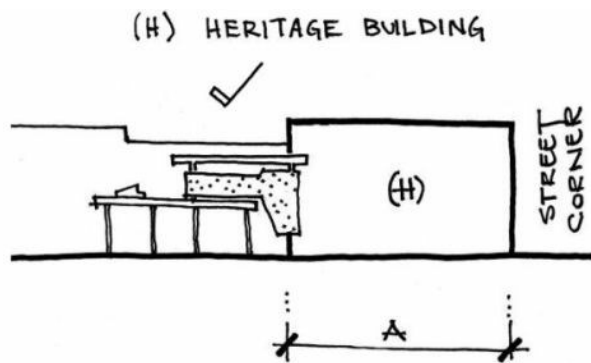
Illustrates an example of a desirable outcome, tall street shelter element does not block views to and from the heritage place. "A" is street width of "H"
